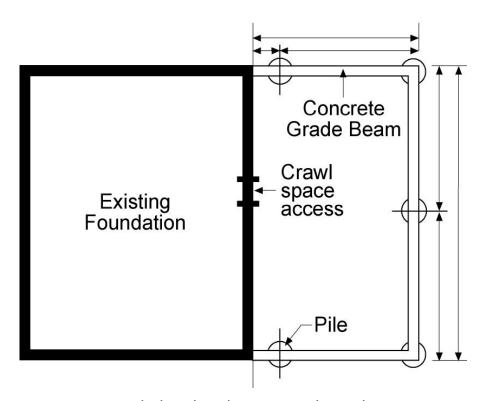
Typical Pile and Grade Beam Foundation Plan
